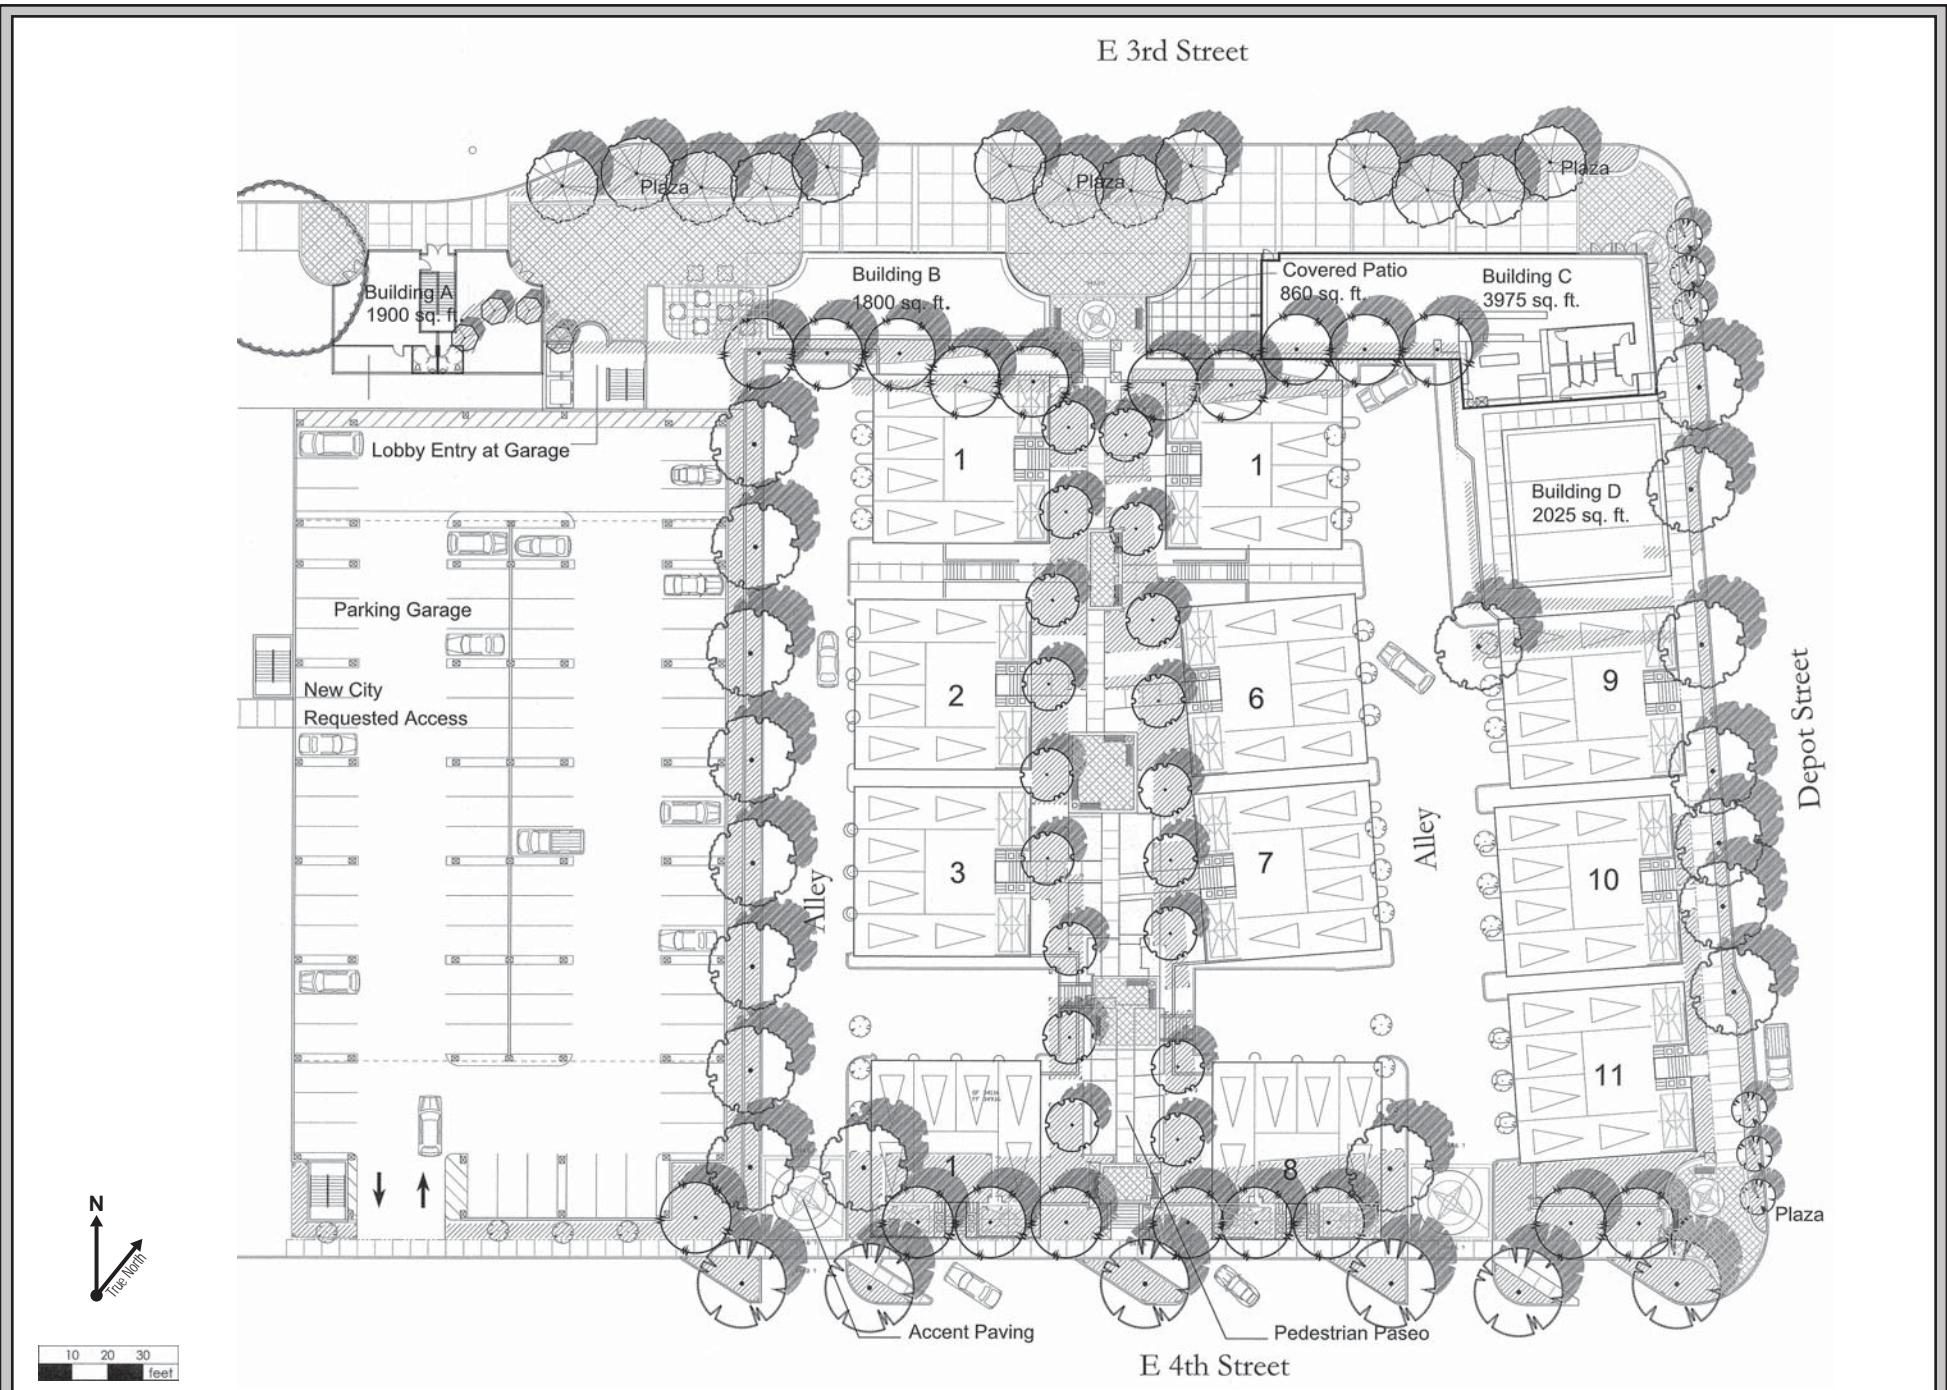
Potential Sunsweet Site Mixed Use Development and Parking Garage
